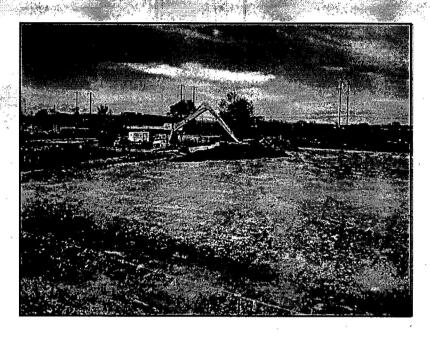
Placement of backfill in hydraulic conveyance line trench.
